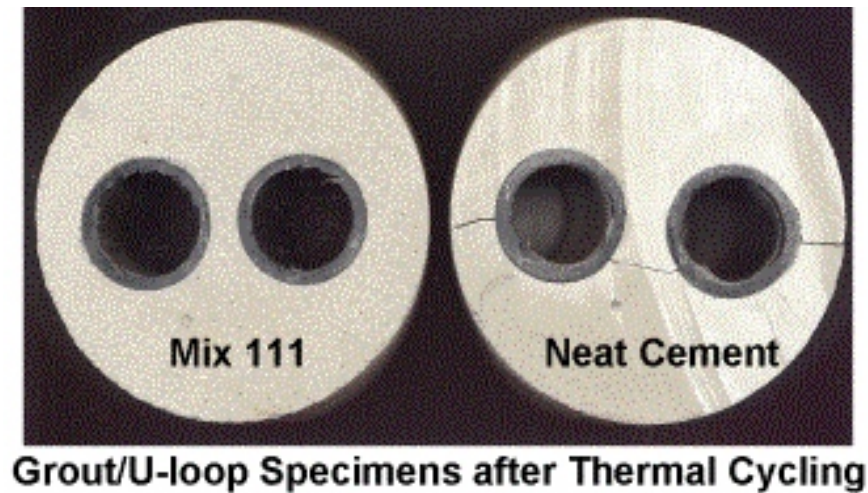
Cracking of neat cement grout after thermal cycle testing of grout and U-loop pipe samples (from Brookhaven National Laboratory).
